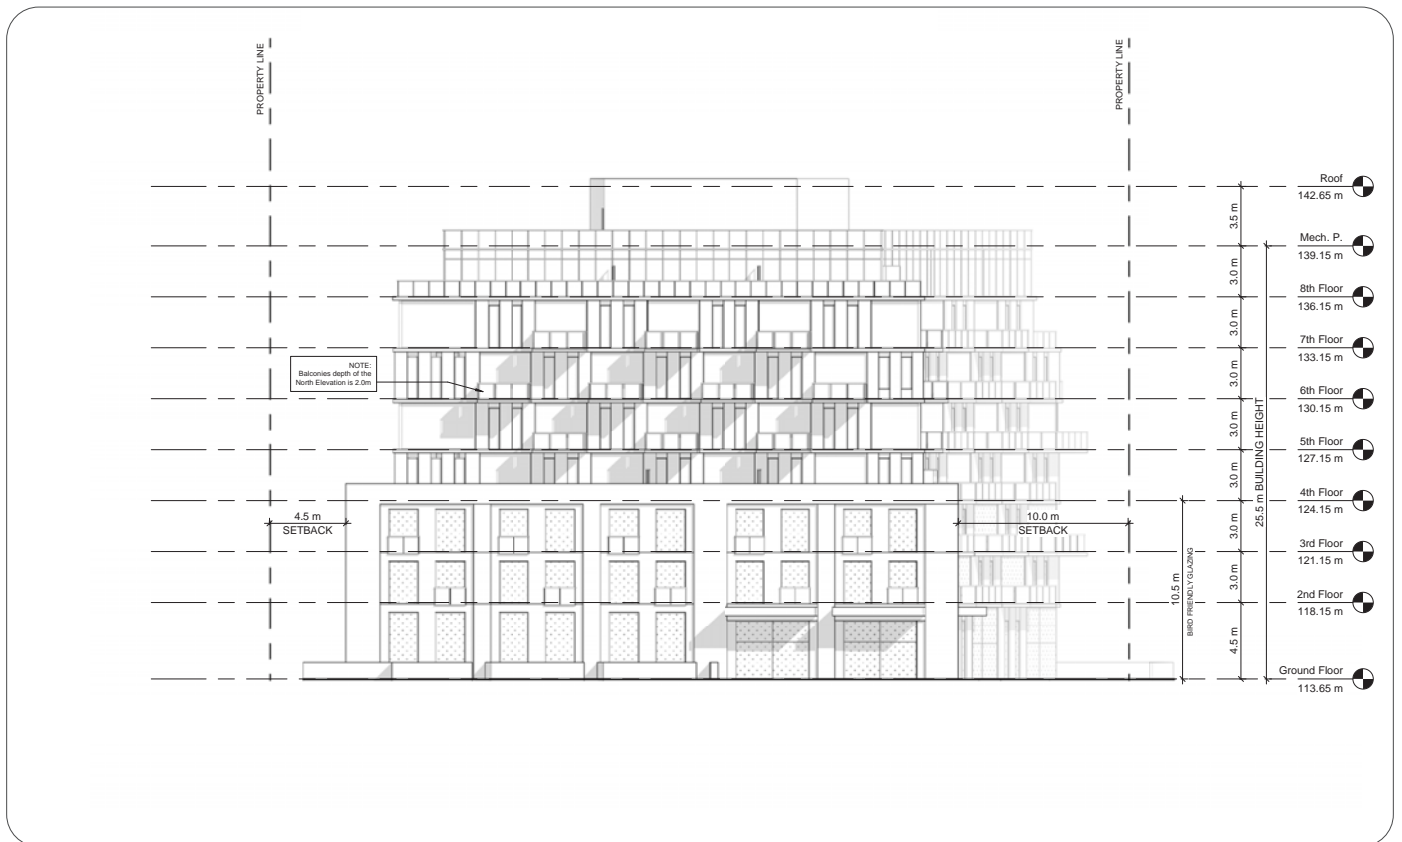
East Elevation, prepared by KFA Architects + Partners Inc.
